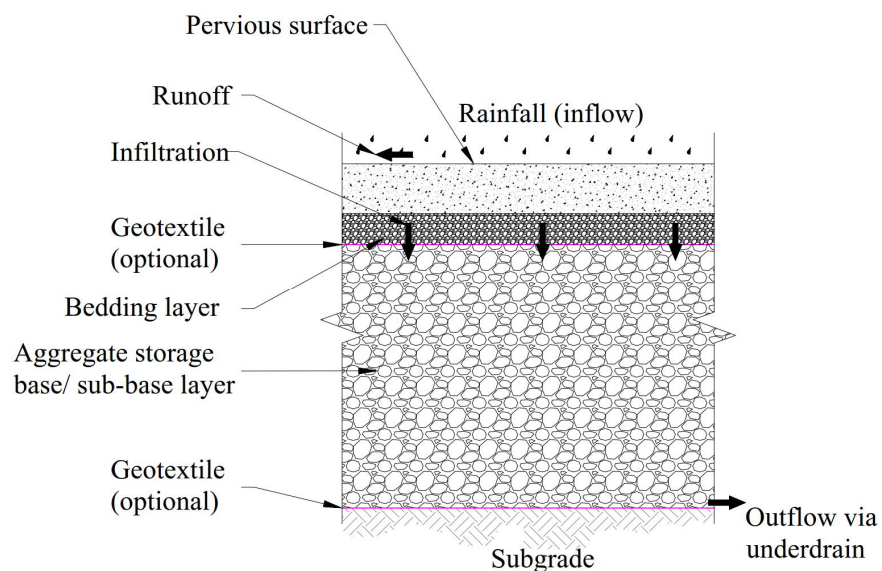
Vertical profile of typical permeable pavement systems with urban stormwater runoff
